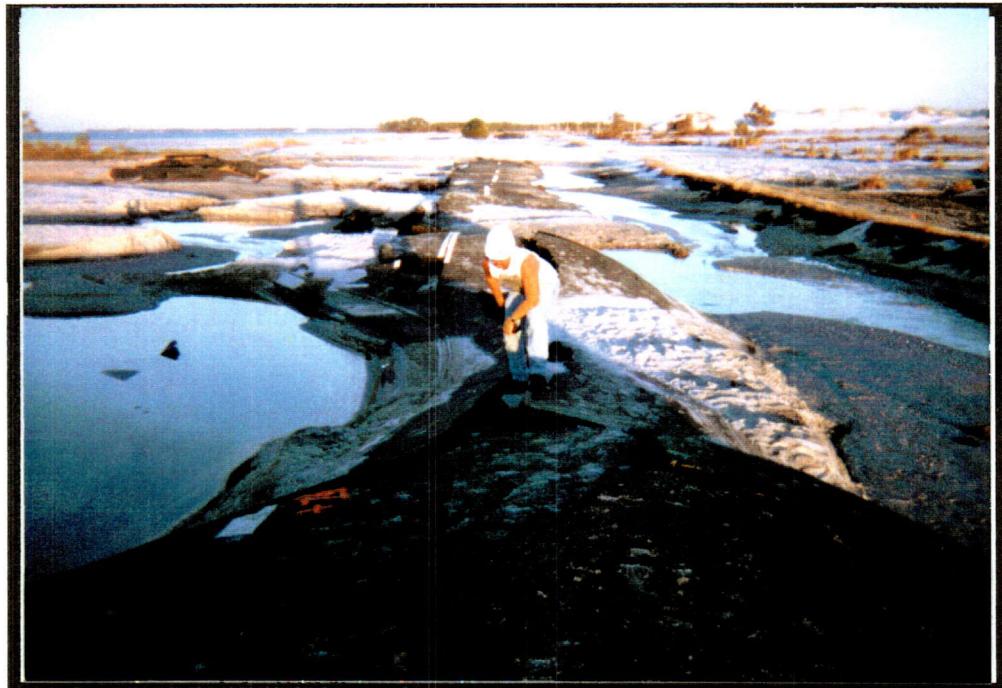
LOCATION SANTA ROSA ISLAND, FL ON
